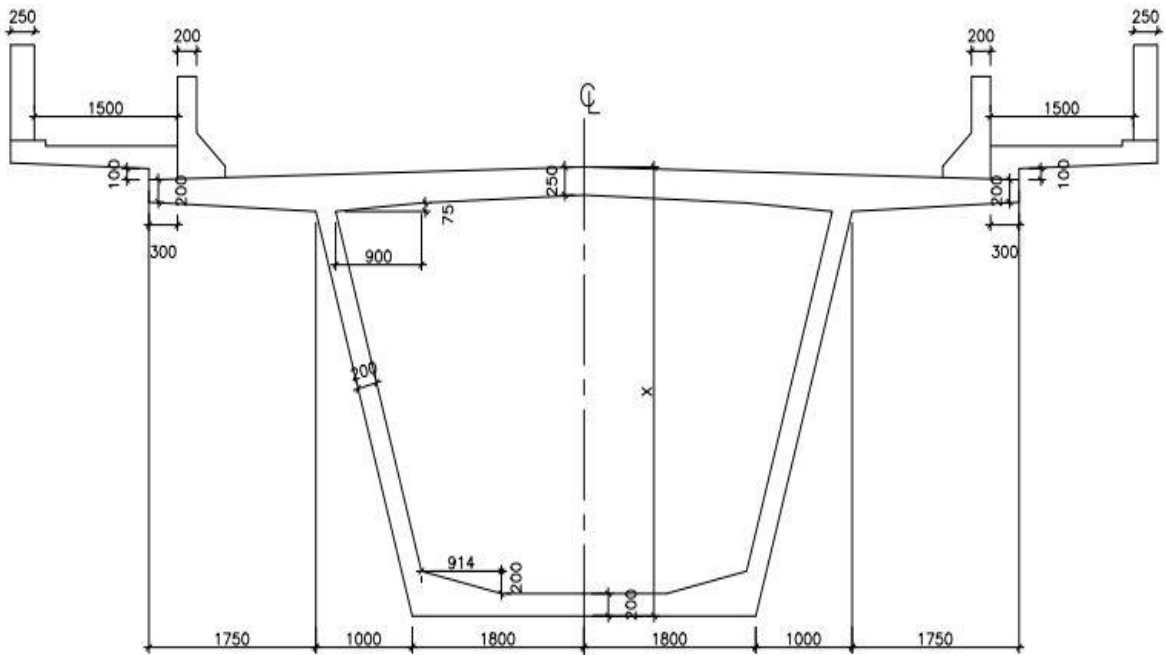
CROSS SECTION OF SINGLE CELL BOX GIRDER
